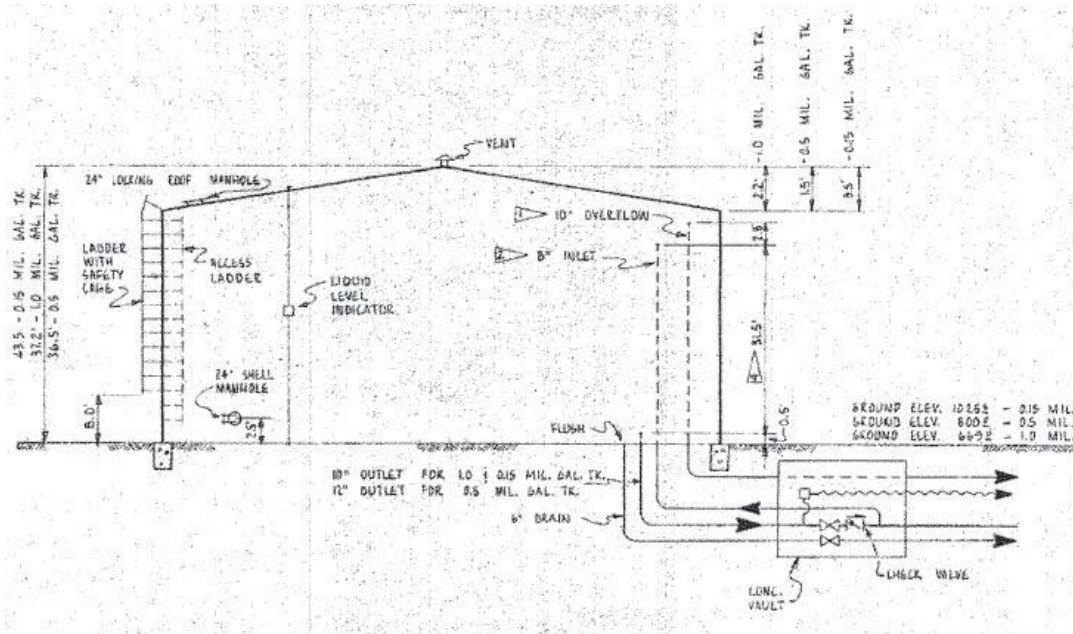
Division 22 Reservoir Elevation View from Original Design Drawings
